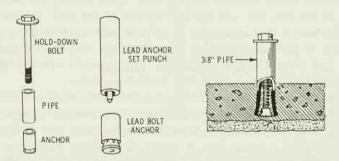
The bolt-anchor method of securing an automatic washer to a cement floor.
